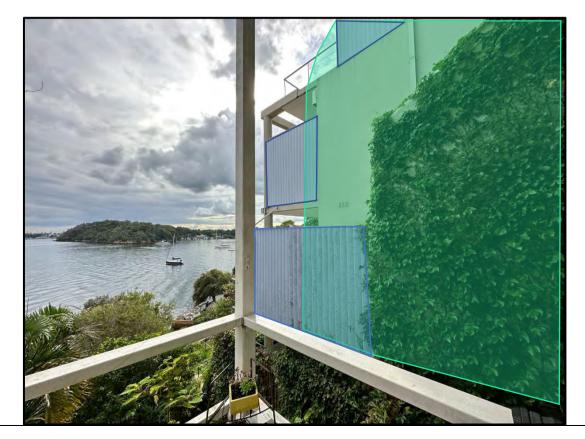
Existing (north-western) view of Berrys Bay and building on subject site – from Unit 3/46 Blues Point Road. Proposed development shaded in green. The existing screens to be removed are shaded in blue.
